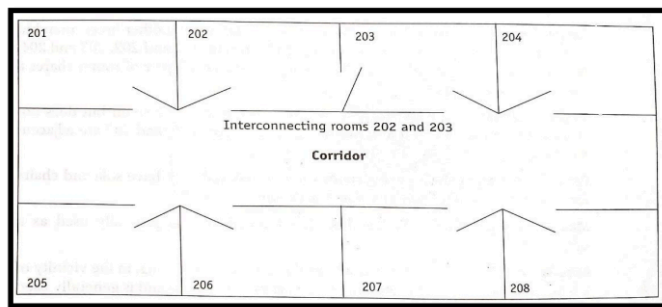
Example of Interconnecting, Adjoining, and Adjacent Room
